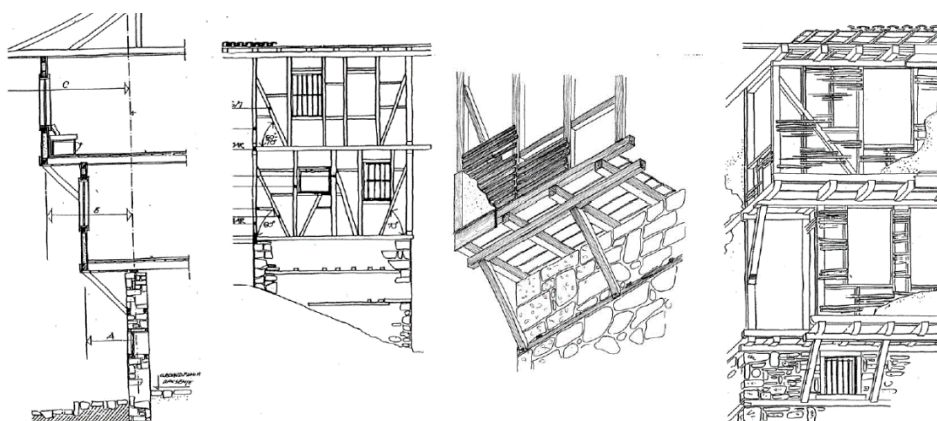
Characteristic Timber-Frame Construction ("Bondruk) in Central Balkans-residential house in the town Ohrid [3]
